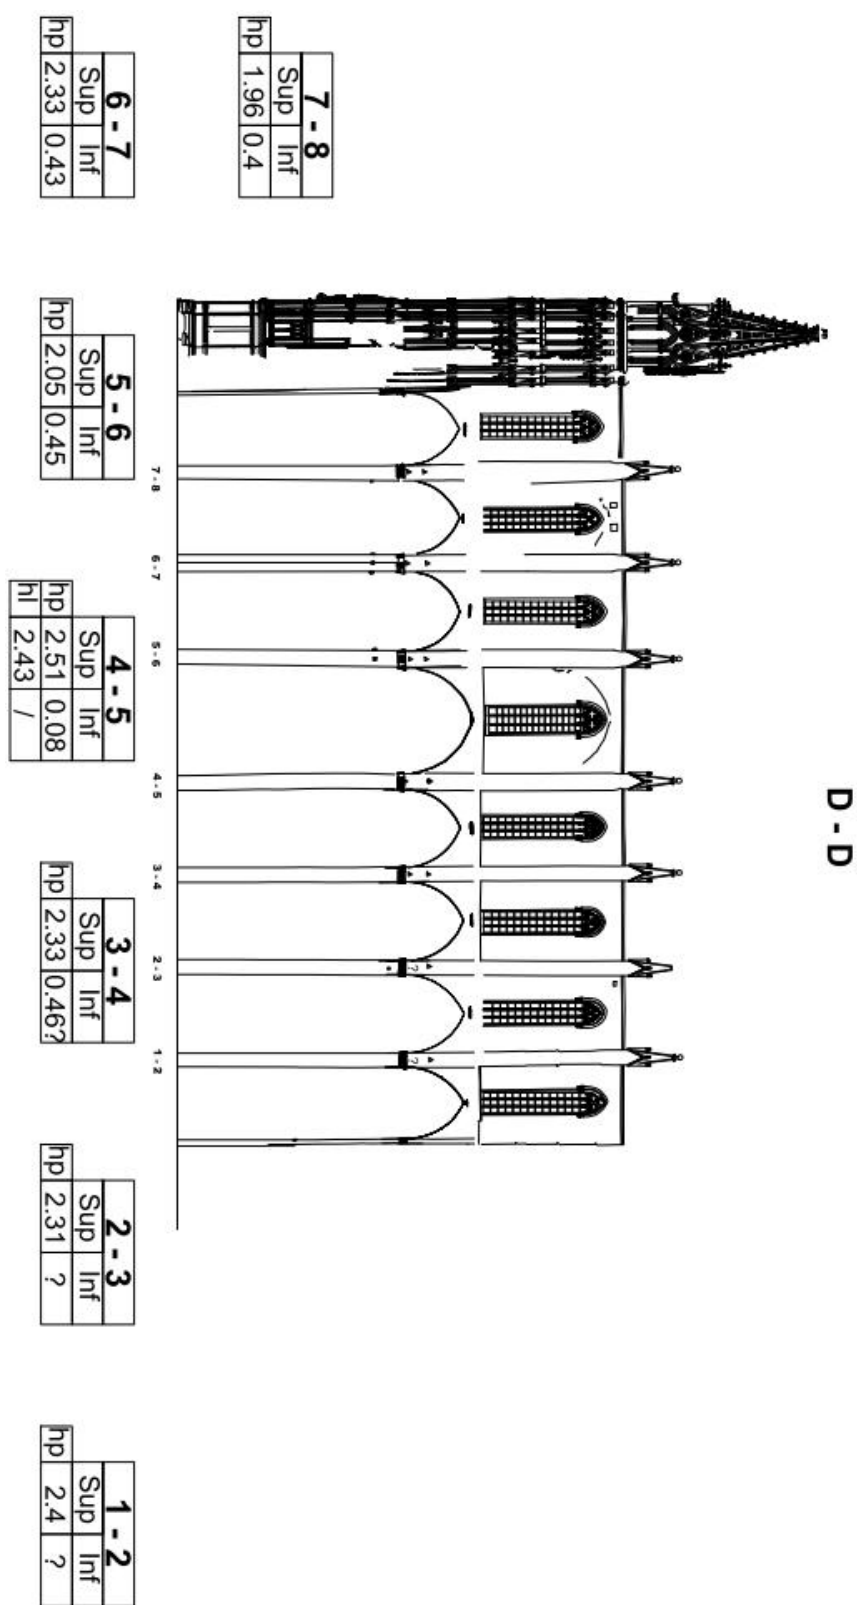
Cut D-D: North lateral nave, exterior elevation
